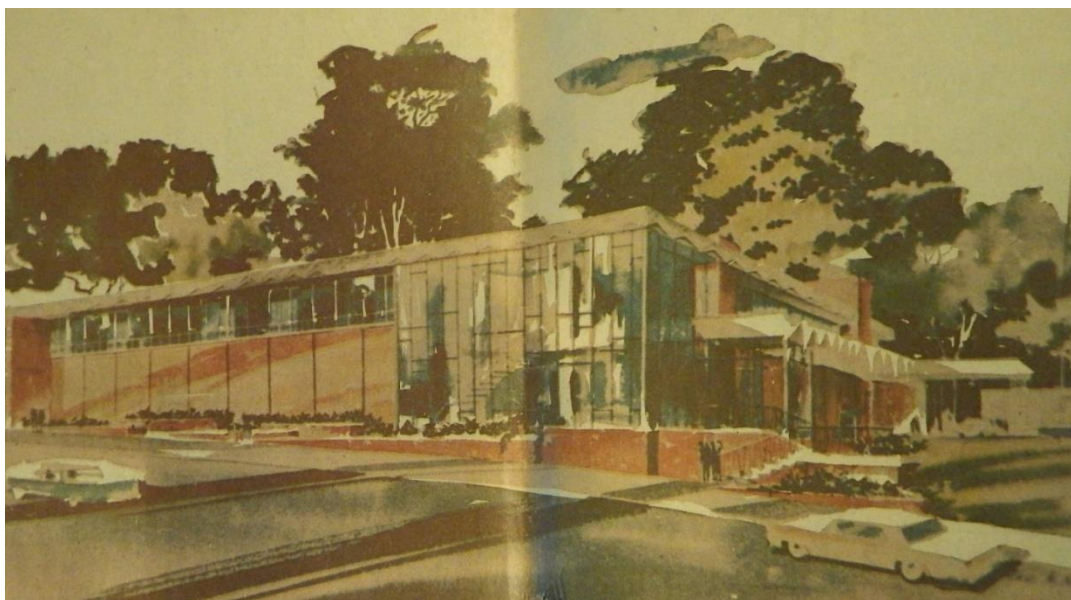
Prospective building elevation sketch by Paul N. Norton, 1962
